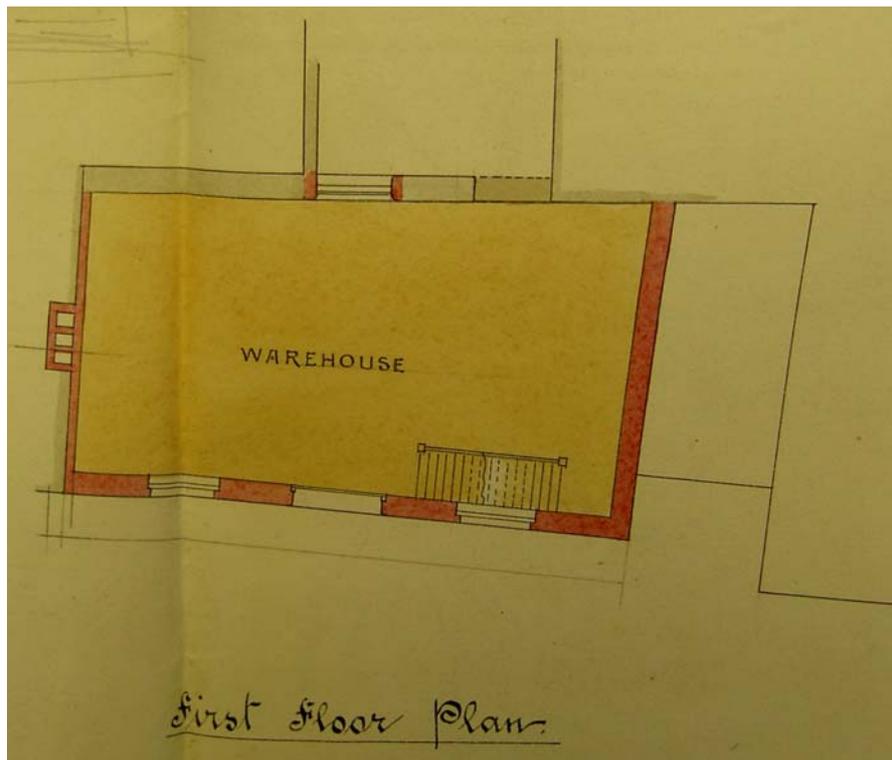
First floor plan of proposed warehouse (CRO(B) Z1392 1877)
